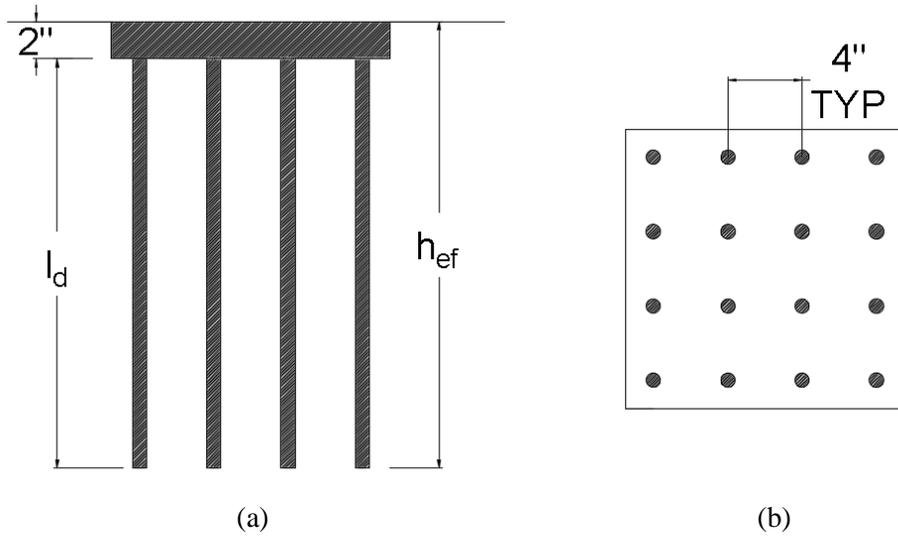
Case study specimen: (a) Section view. (b) Plan view.
